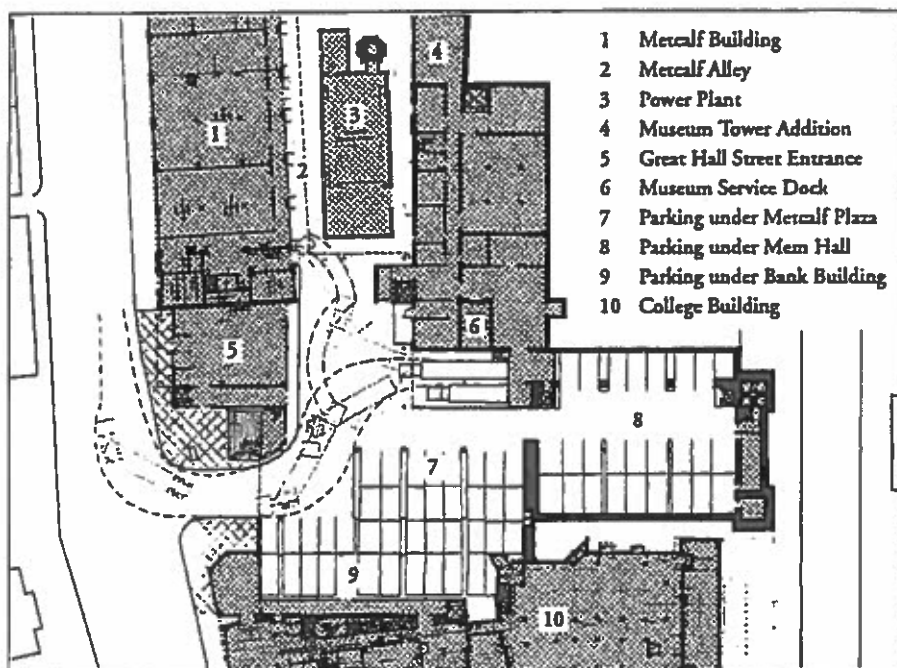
Plan of proposed service level under the Great Hall and Metcalf Plaza
